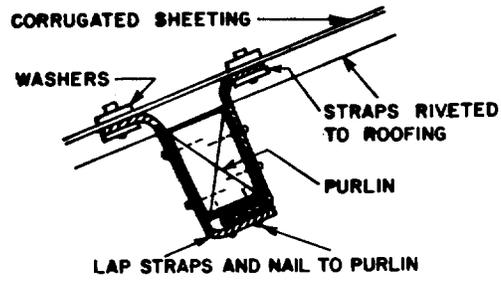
Details of corrugated sheet fixing to purlins with straps
